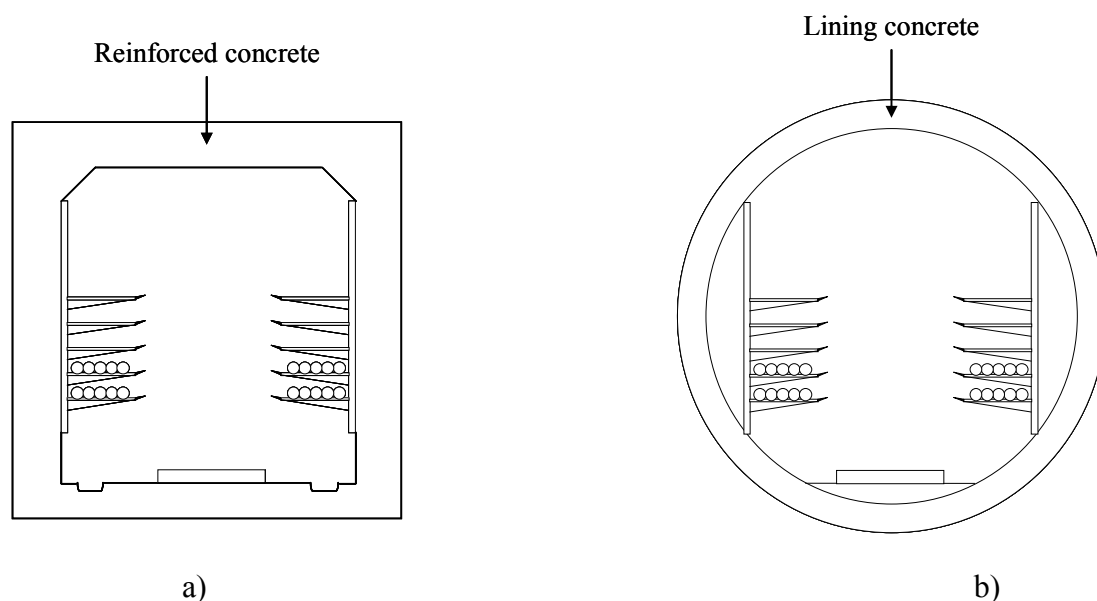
Typical types of cable tunnel: a) rectangular or box type; and b) circular type
